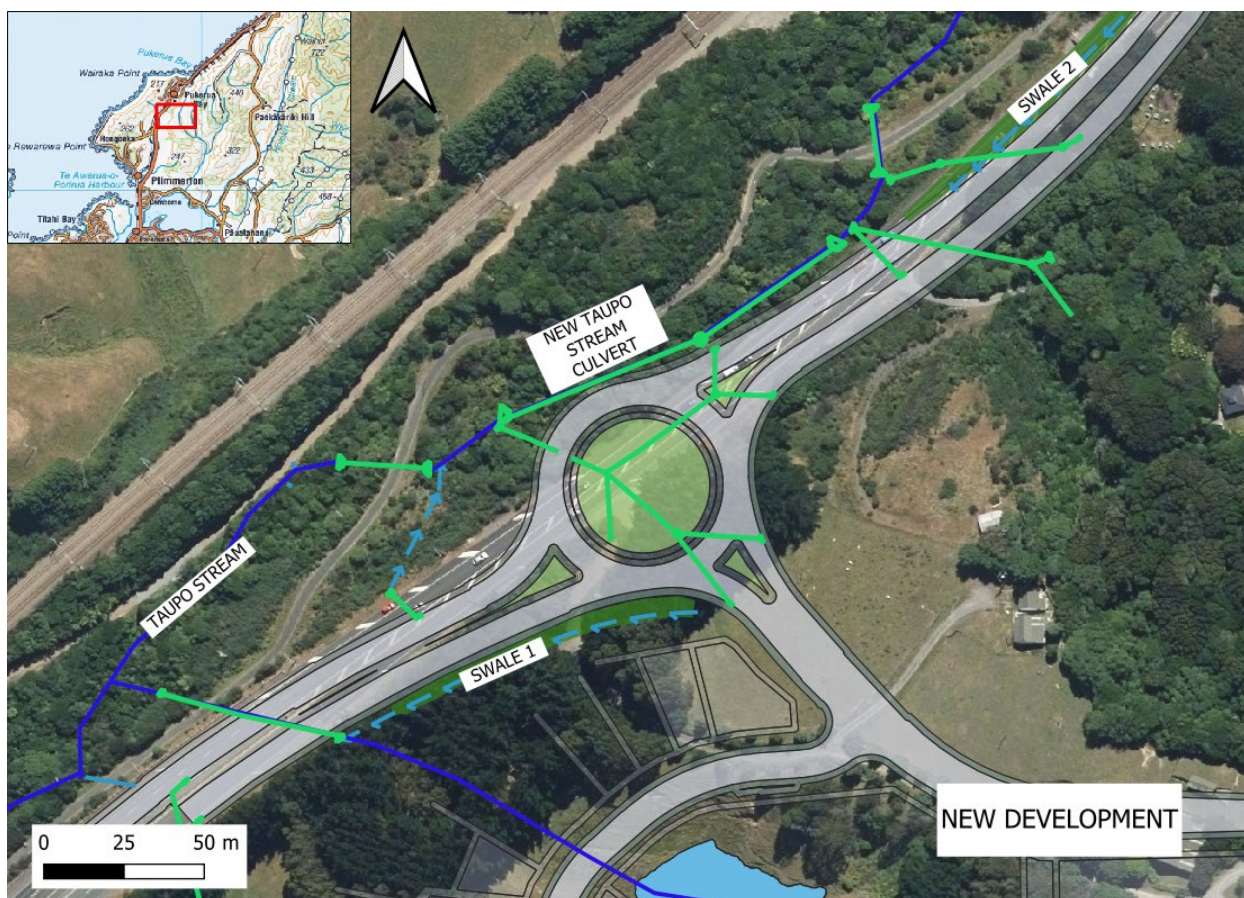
Proposed roundabout on SH59 with stormwater infrastructure (draft)
